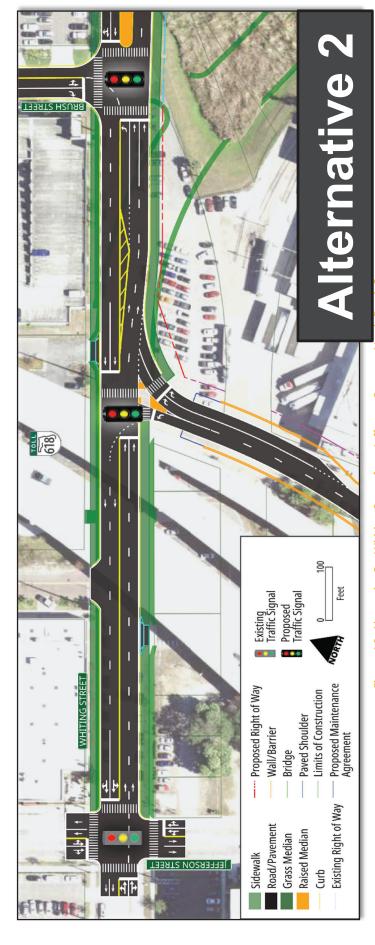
Alternative 2 – Whiting Street from Jefferson Street to North Brush Street
